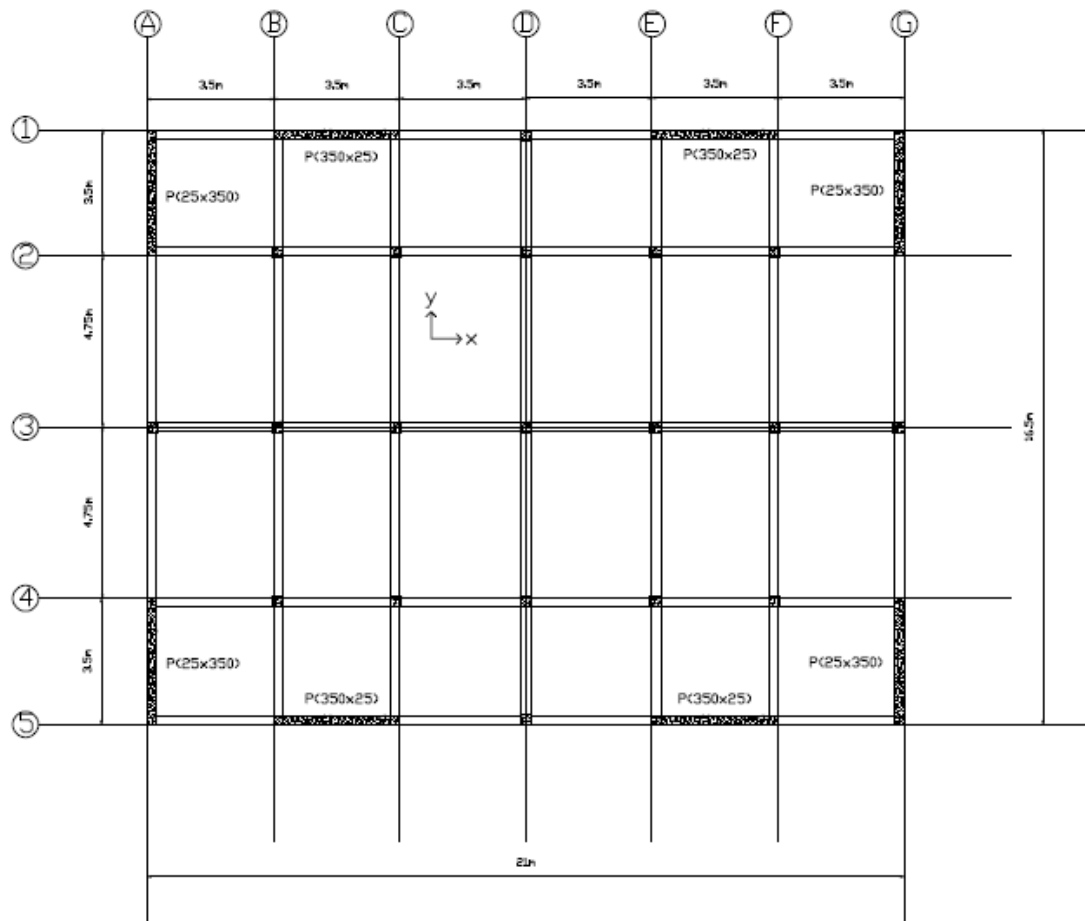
Plan of Model 21 with 30x30 Column Size and Wall Area to Floor Area Ratio of 1.0% in each Direction
